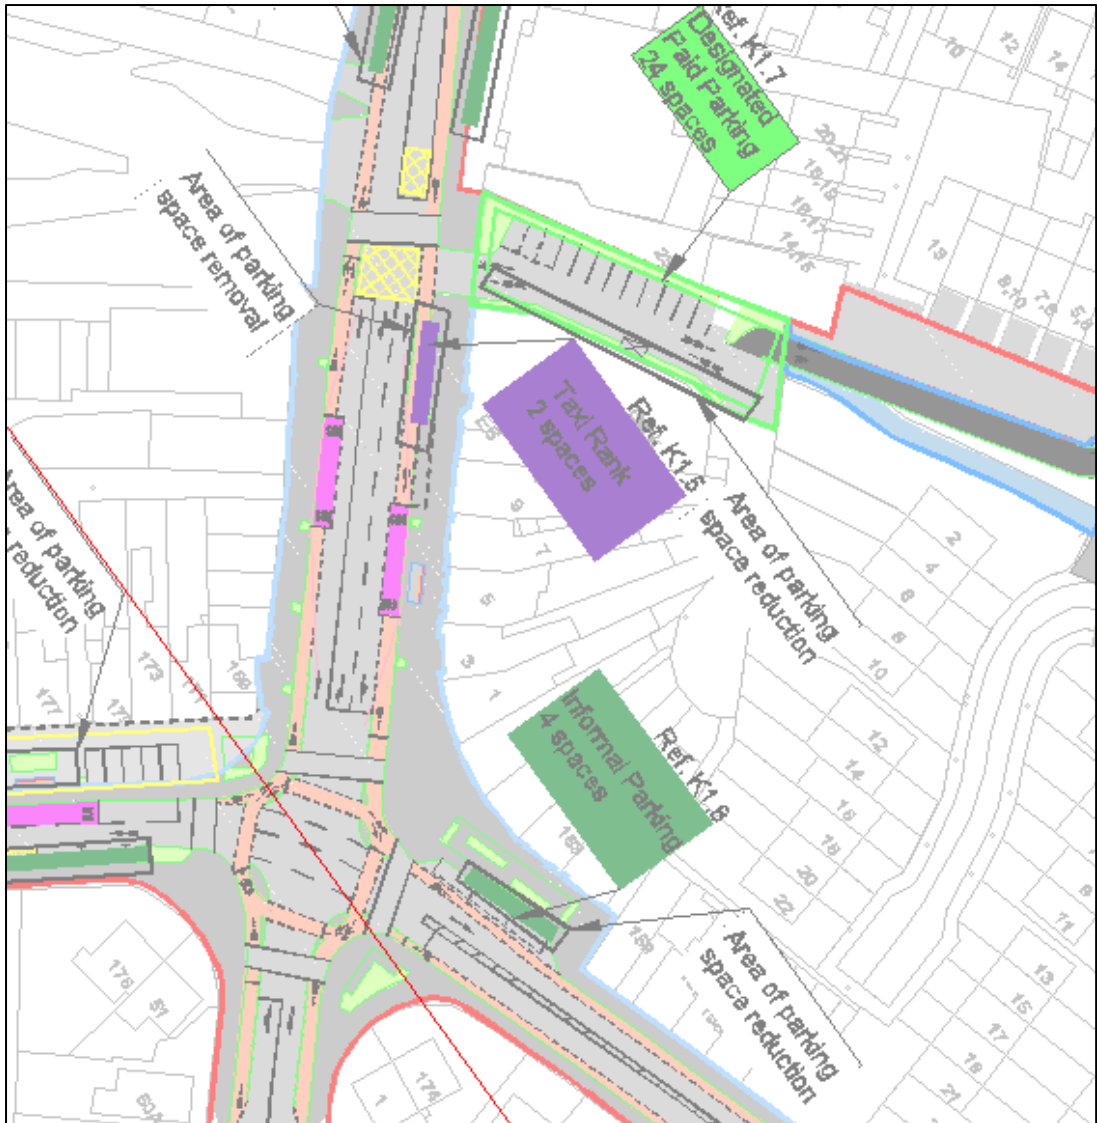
Proposed scheme design and parking changes along Sundrive Road
